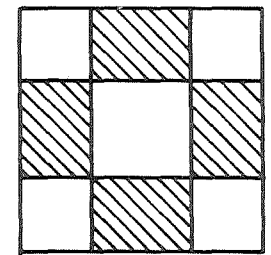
(a) SLAB LAYOUT NOTATION
